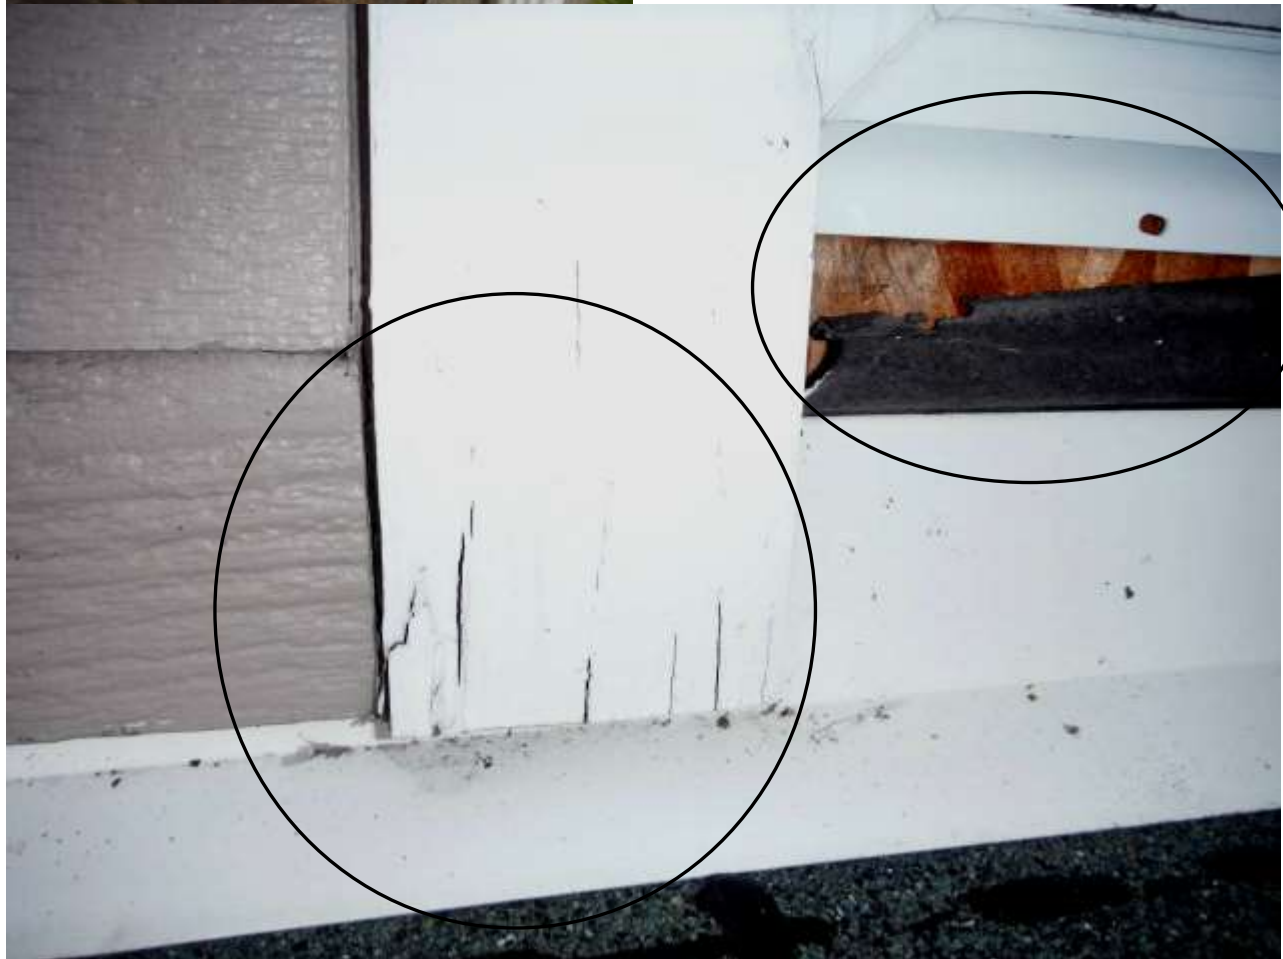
Example of rotted wood trim and missing flashings under all the upper windows; water entry points.
